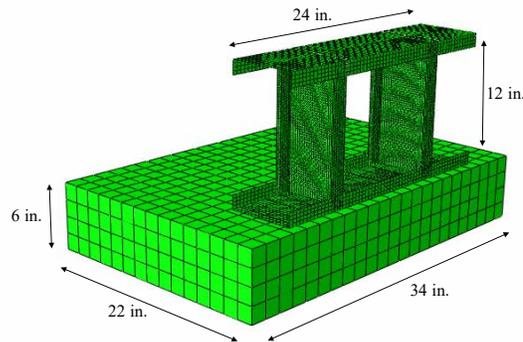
Finite element model of stud-track assembly placed on top of a concrete slab with 1 inch edge distance; the studs are 600S162-54 and the tracks are 600T125-54
